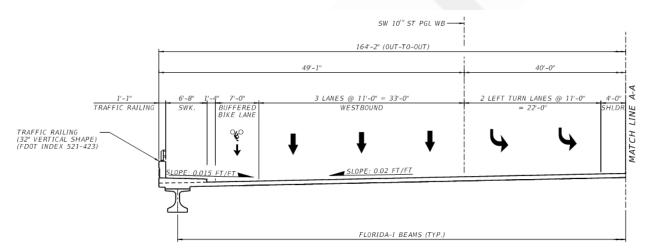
Bridge Typical Section (Bridge No. 12) 1 of 2
